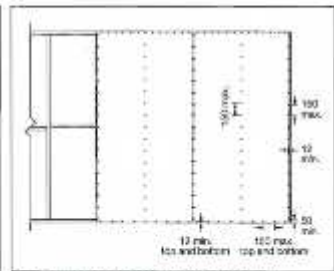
NAILING DETAIL FOR HARDIBRACE BASE SHEETS
